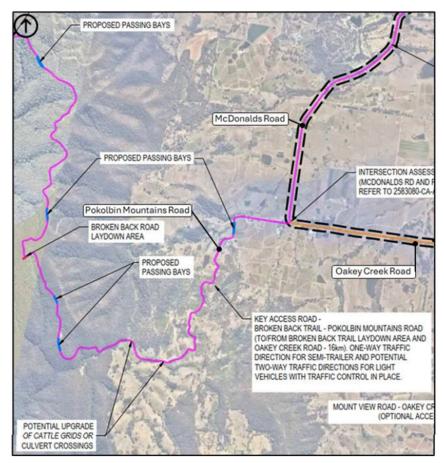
Proposed passing bays on Pokolbin Mountains Road
